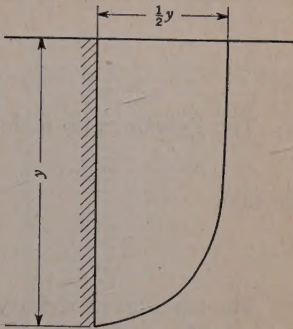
TYPICAL SECTION OF A FRACTURE SURFACE
